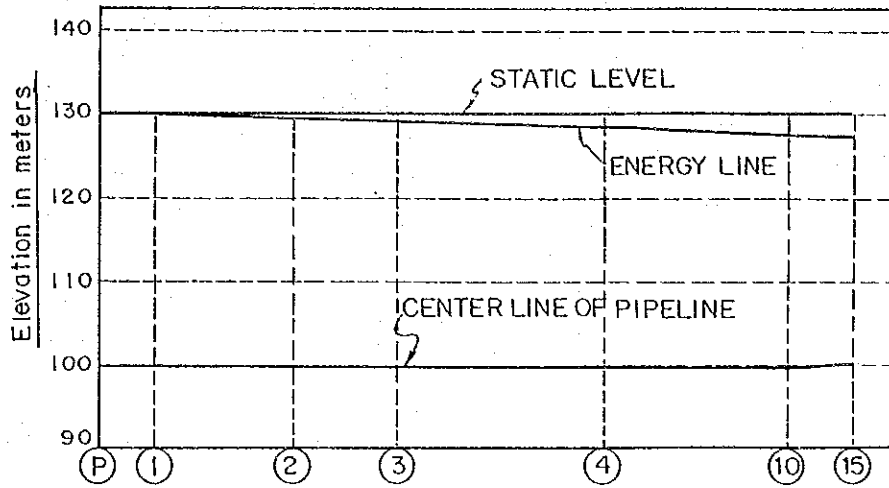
Schematic Pipeline Layout of Nepalgunj Sub - center
